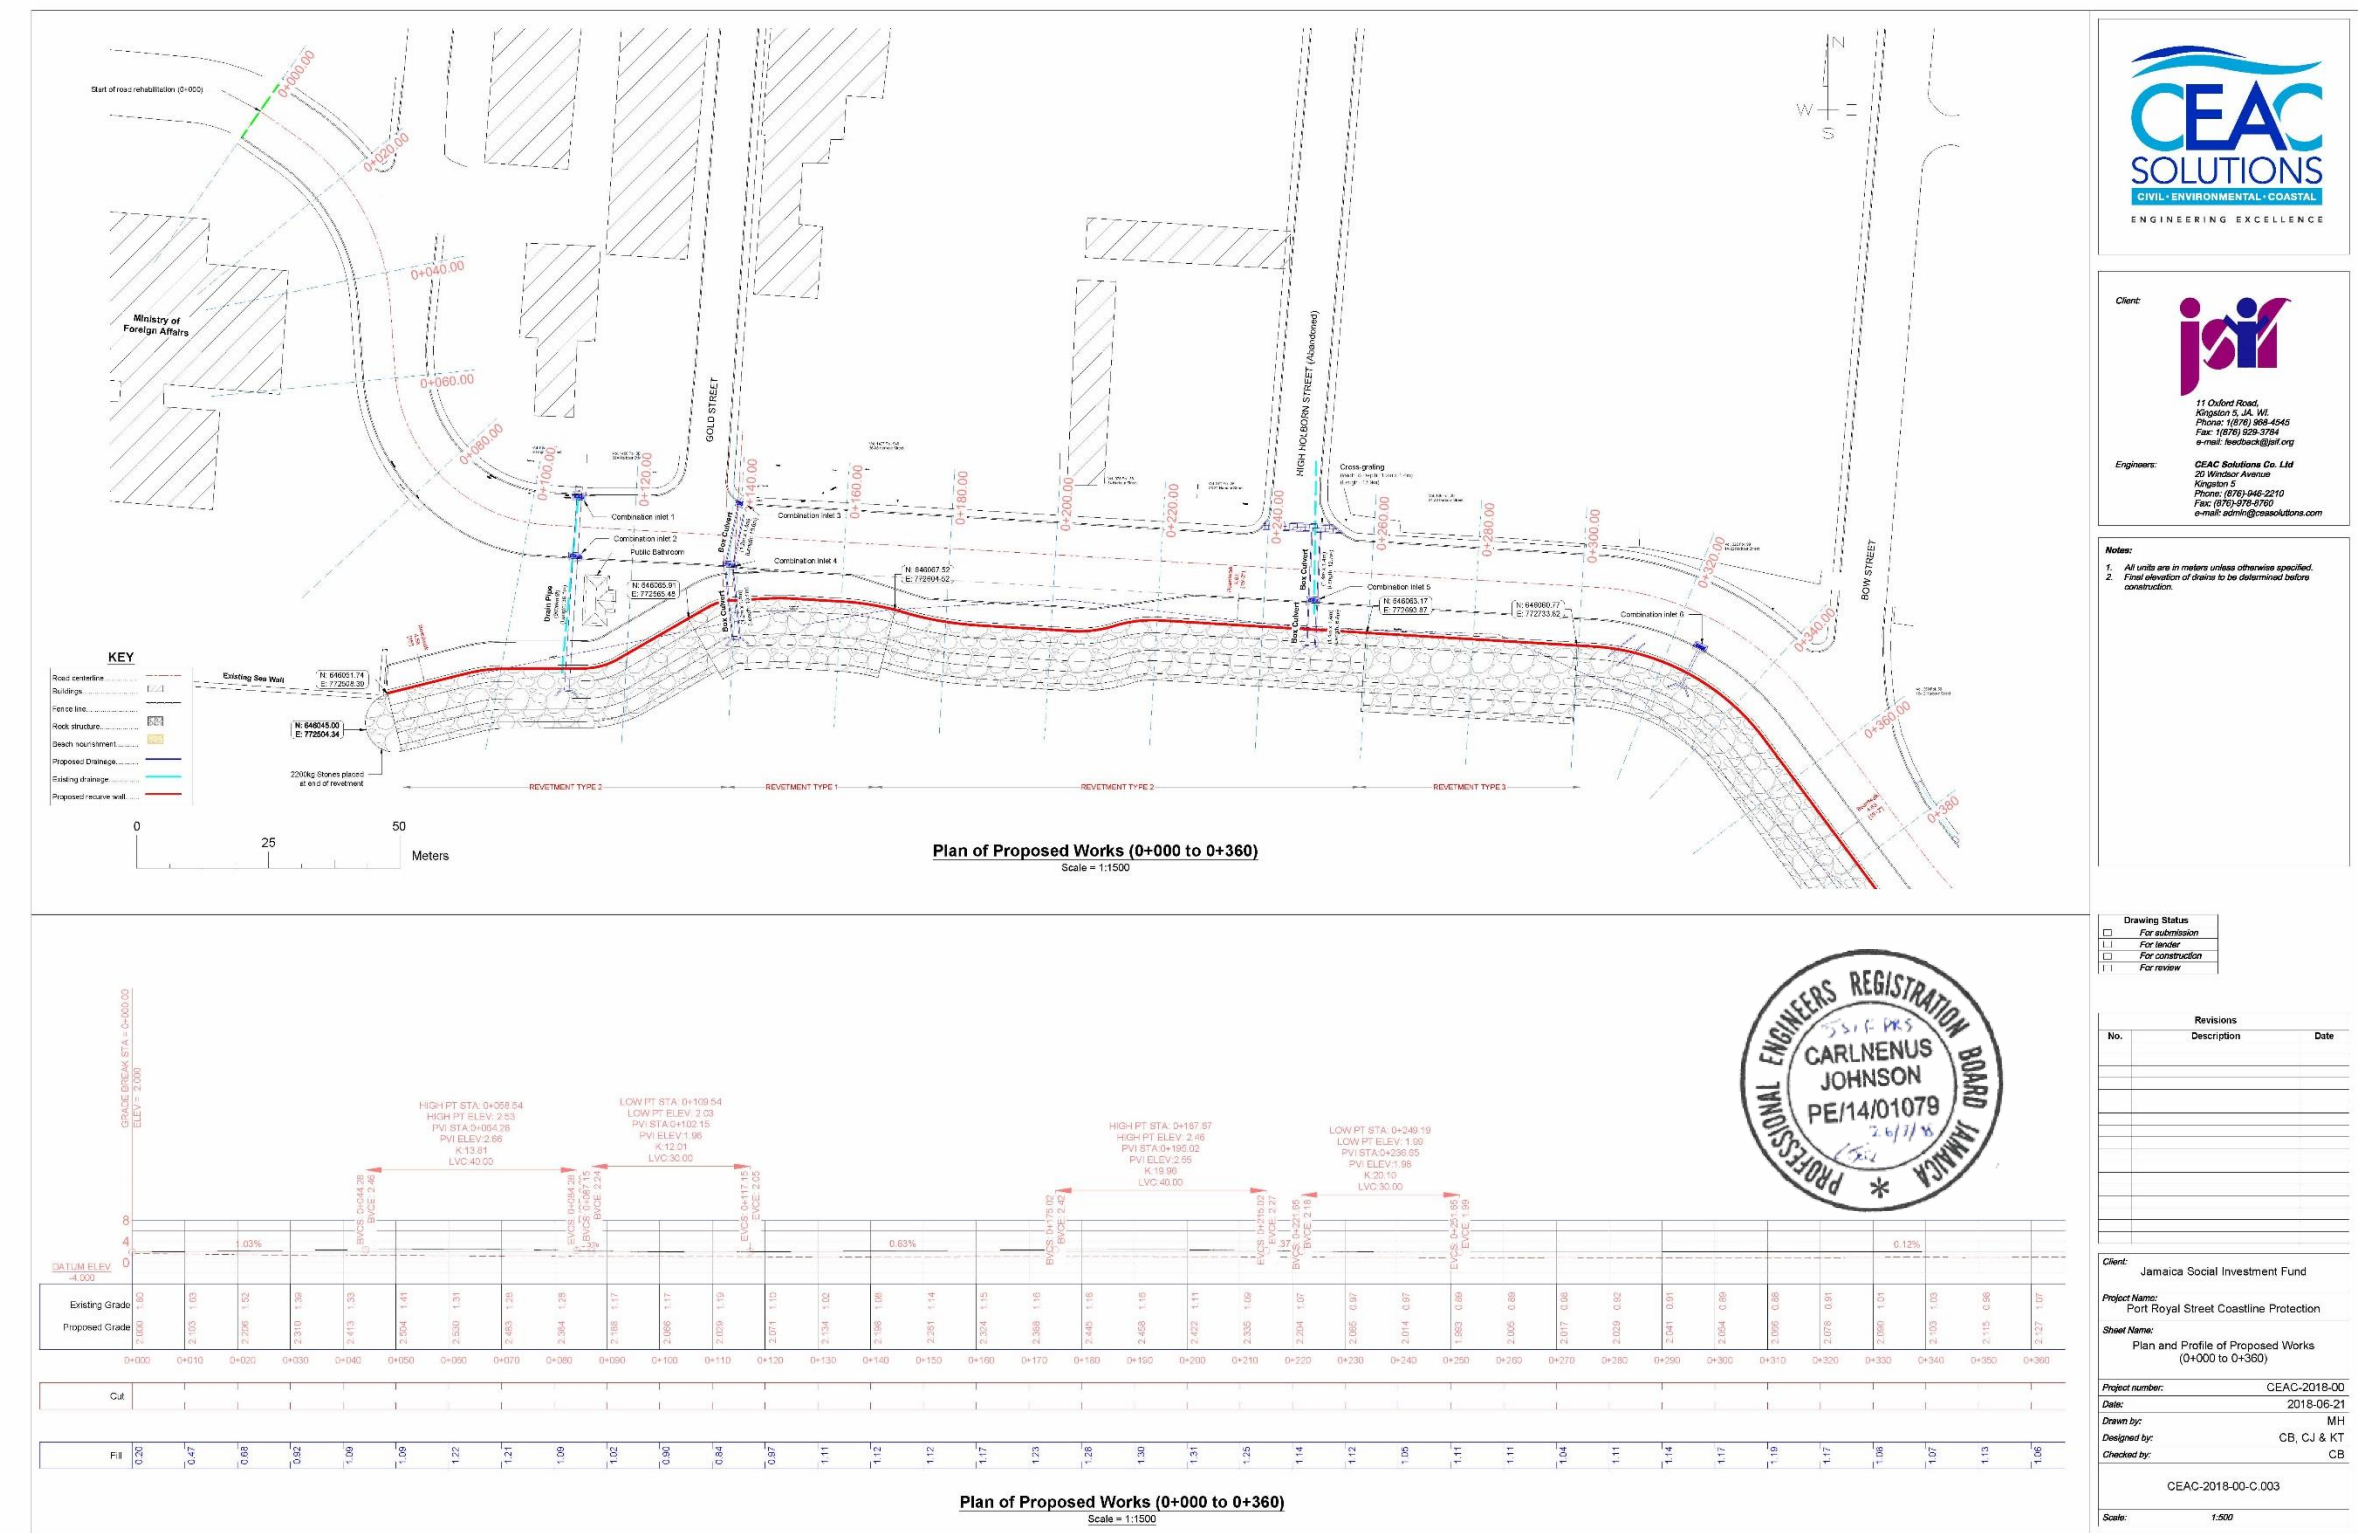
Plan and Profile of Proposed Works (0+000 to 0+360)
